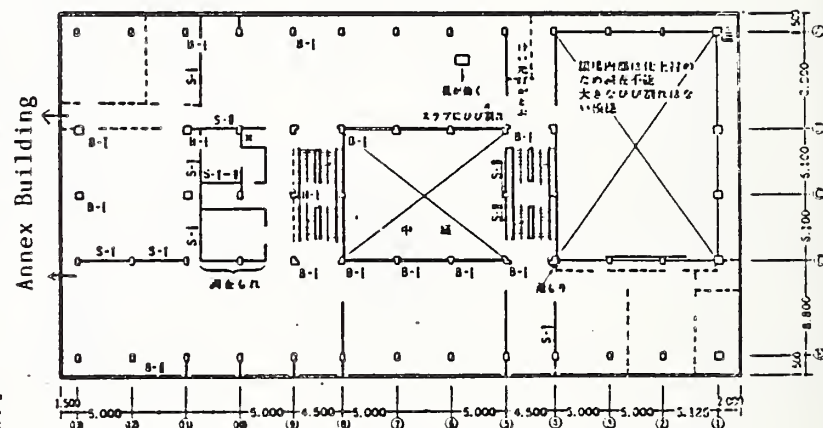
Third Floor Plan of Old City Office and the Damage in 1968 (Ref.4)
